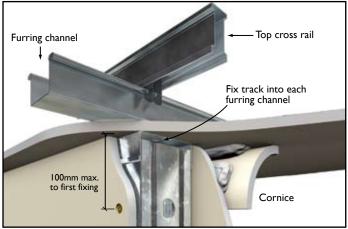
B:Wall/Ceiling intersection detail with friction fit for cornice applications
